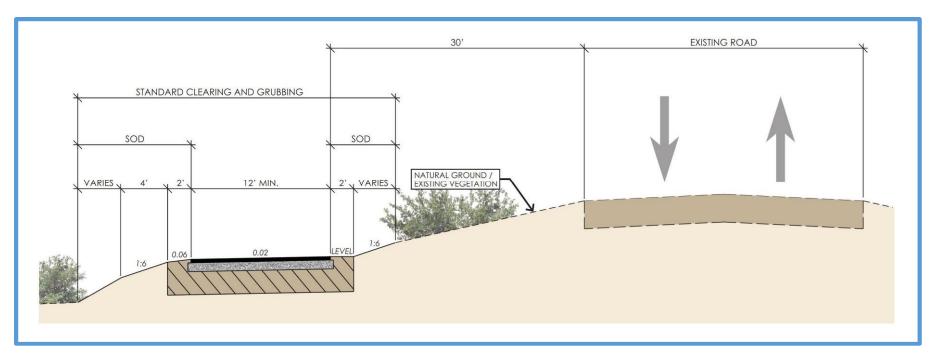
Typical Section, N-S MINWR Alternative 2
